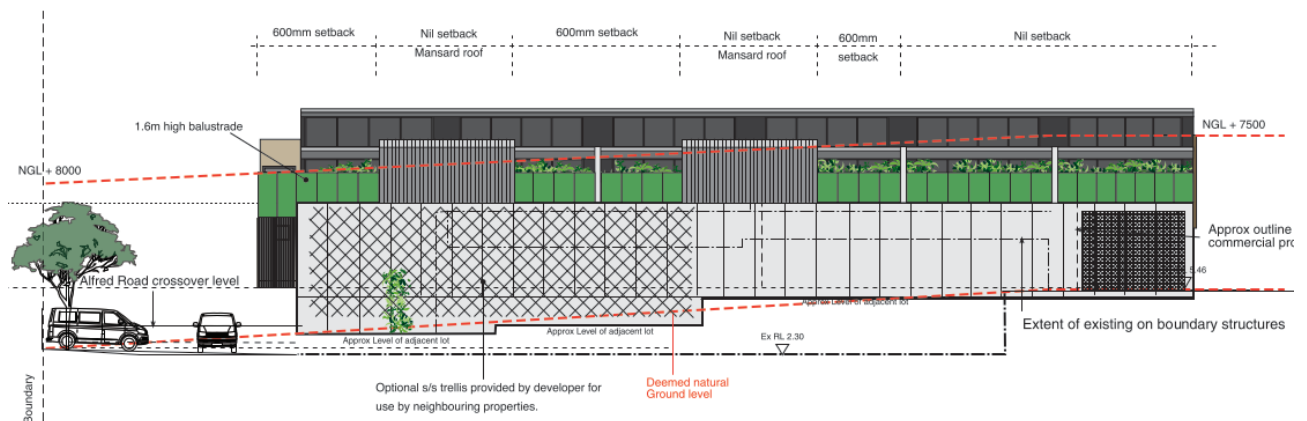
Amended side elevation (north) – Plans dated 19 December 2021
